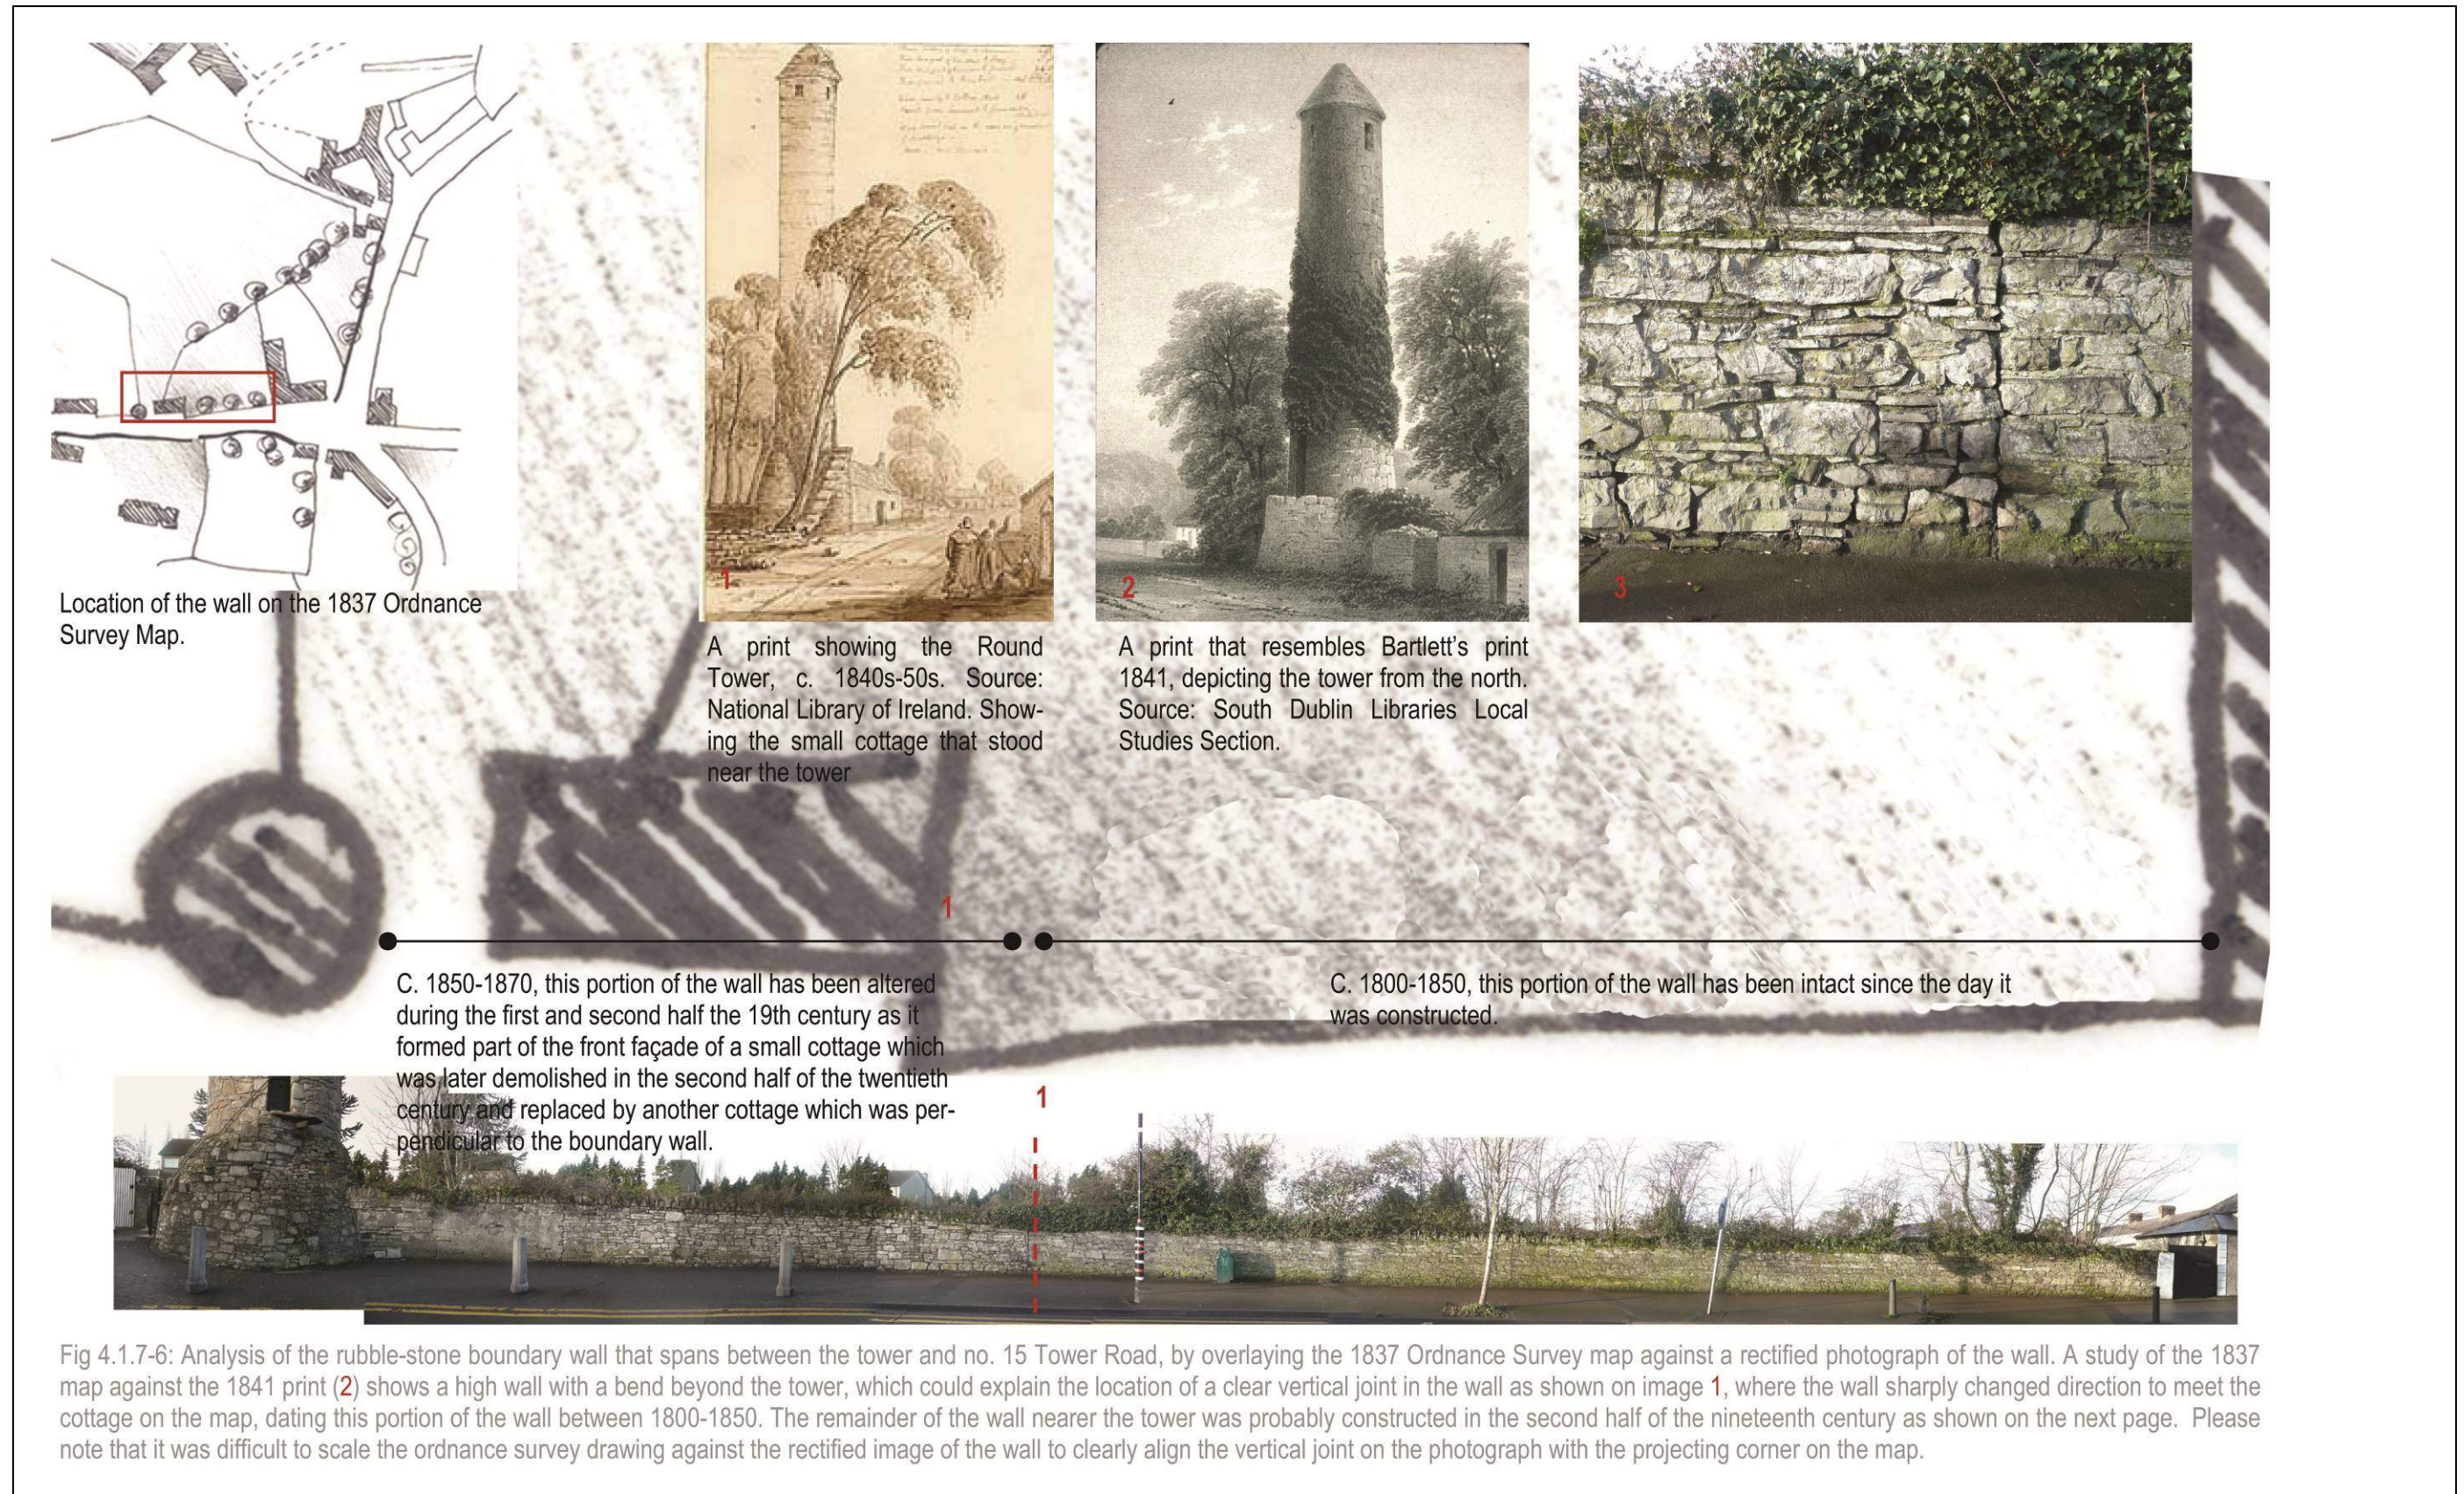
An extract from page 40 of the report "Round Tower Site, Clondalkin – Design and Conservation Report" "commissioned by South Dublin County Council from Shaffrey Associates, Architects (2008). The southern half of the wall nearer to the round tower was probably constructed in the second half of the nineteenth century as part of the boundary to Moyle Park House. However it incorporated some much older wall and building fabric as noted above.
